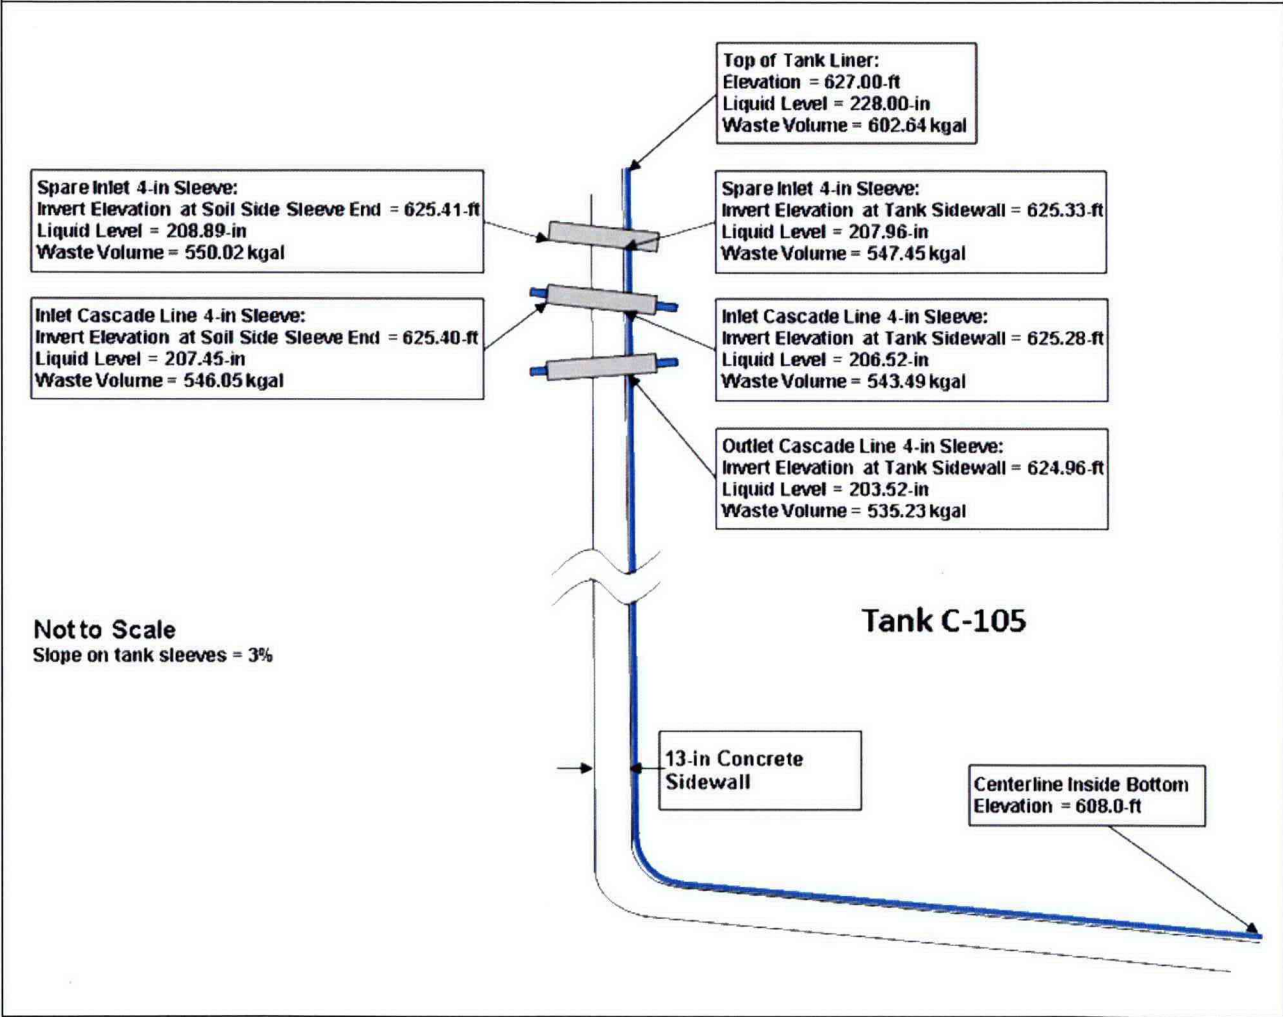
Tank C-105 Overflow Beachline with Cascade and Inlet Lines
